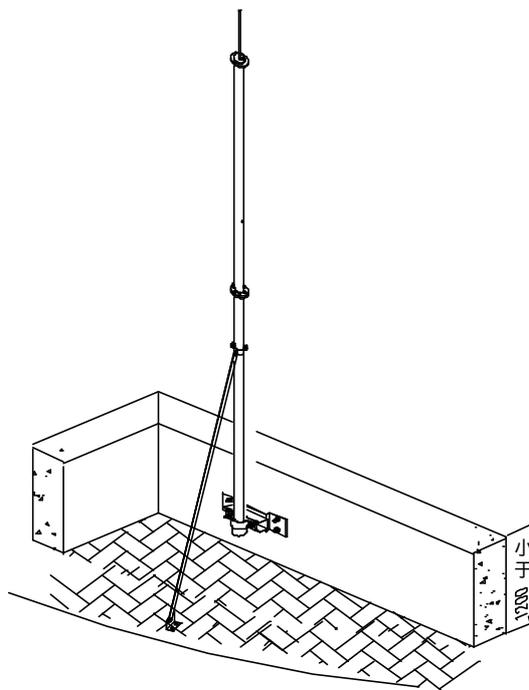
Antenna support fixed on parapet (with parapet shorter than 1200MM)
